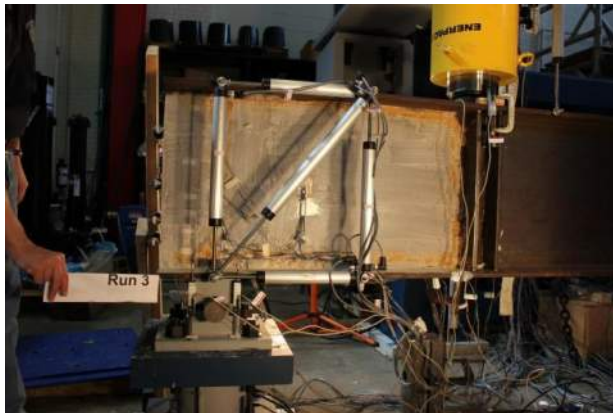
Undamaged Girder Right: 80 kip
